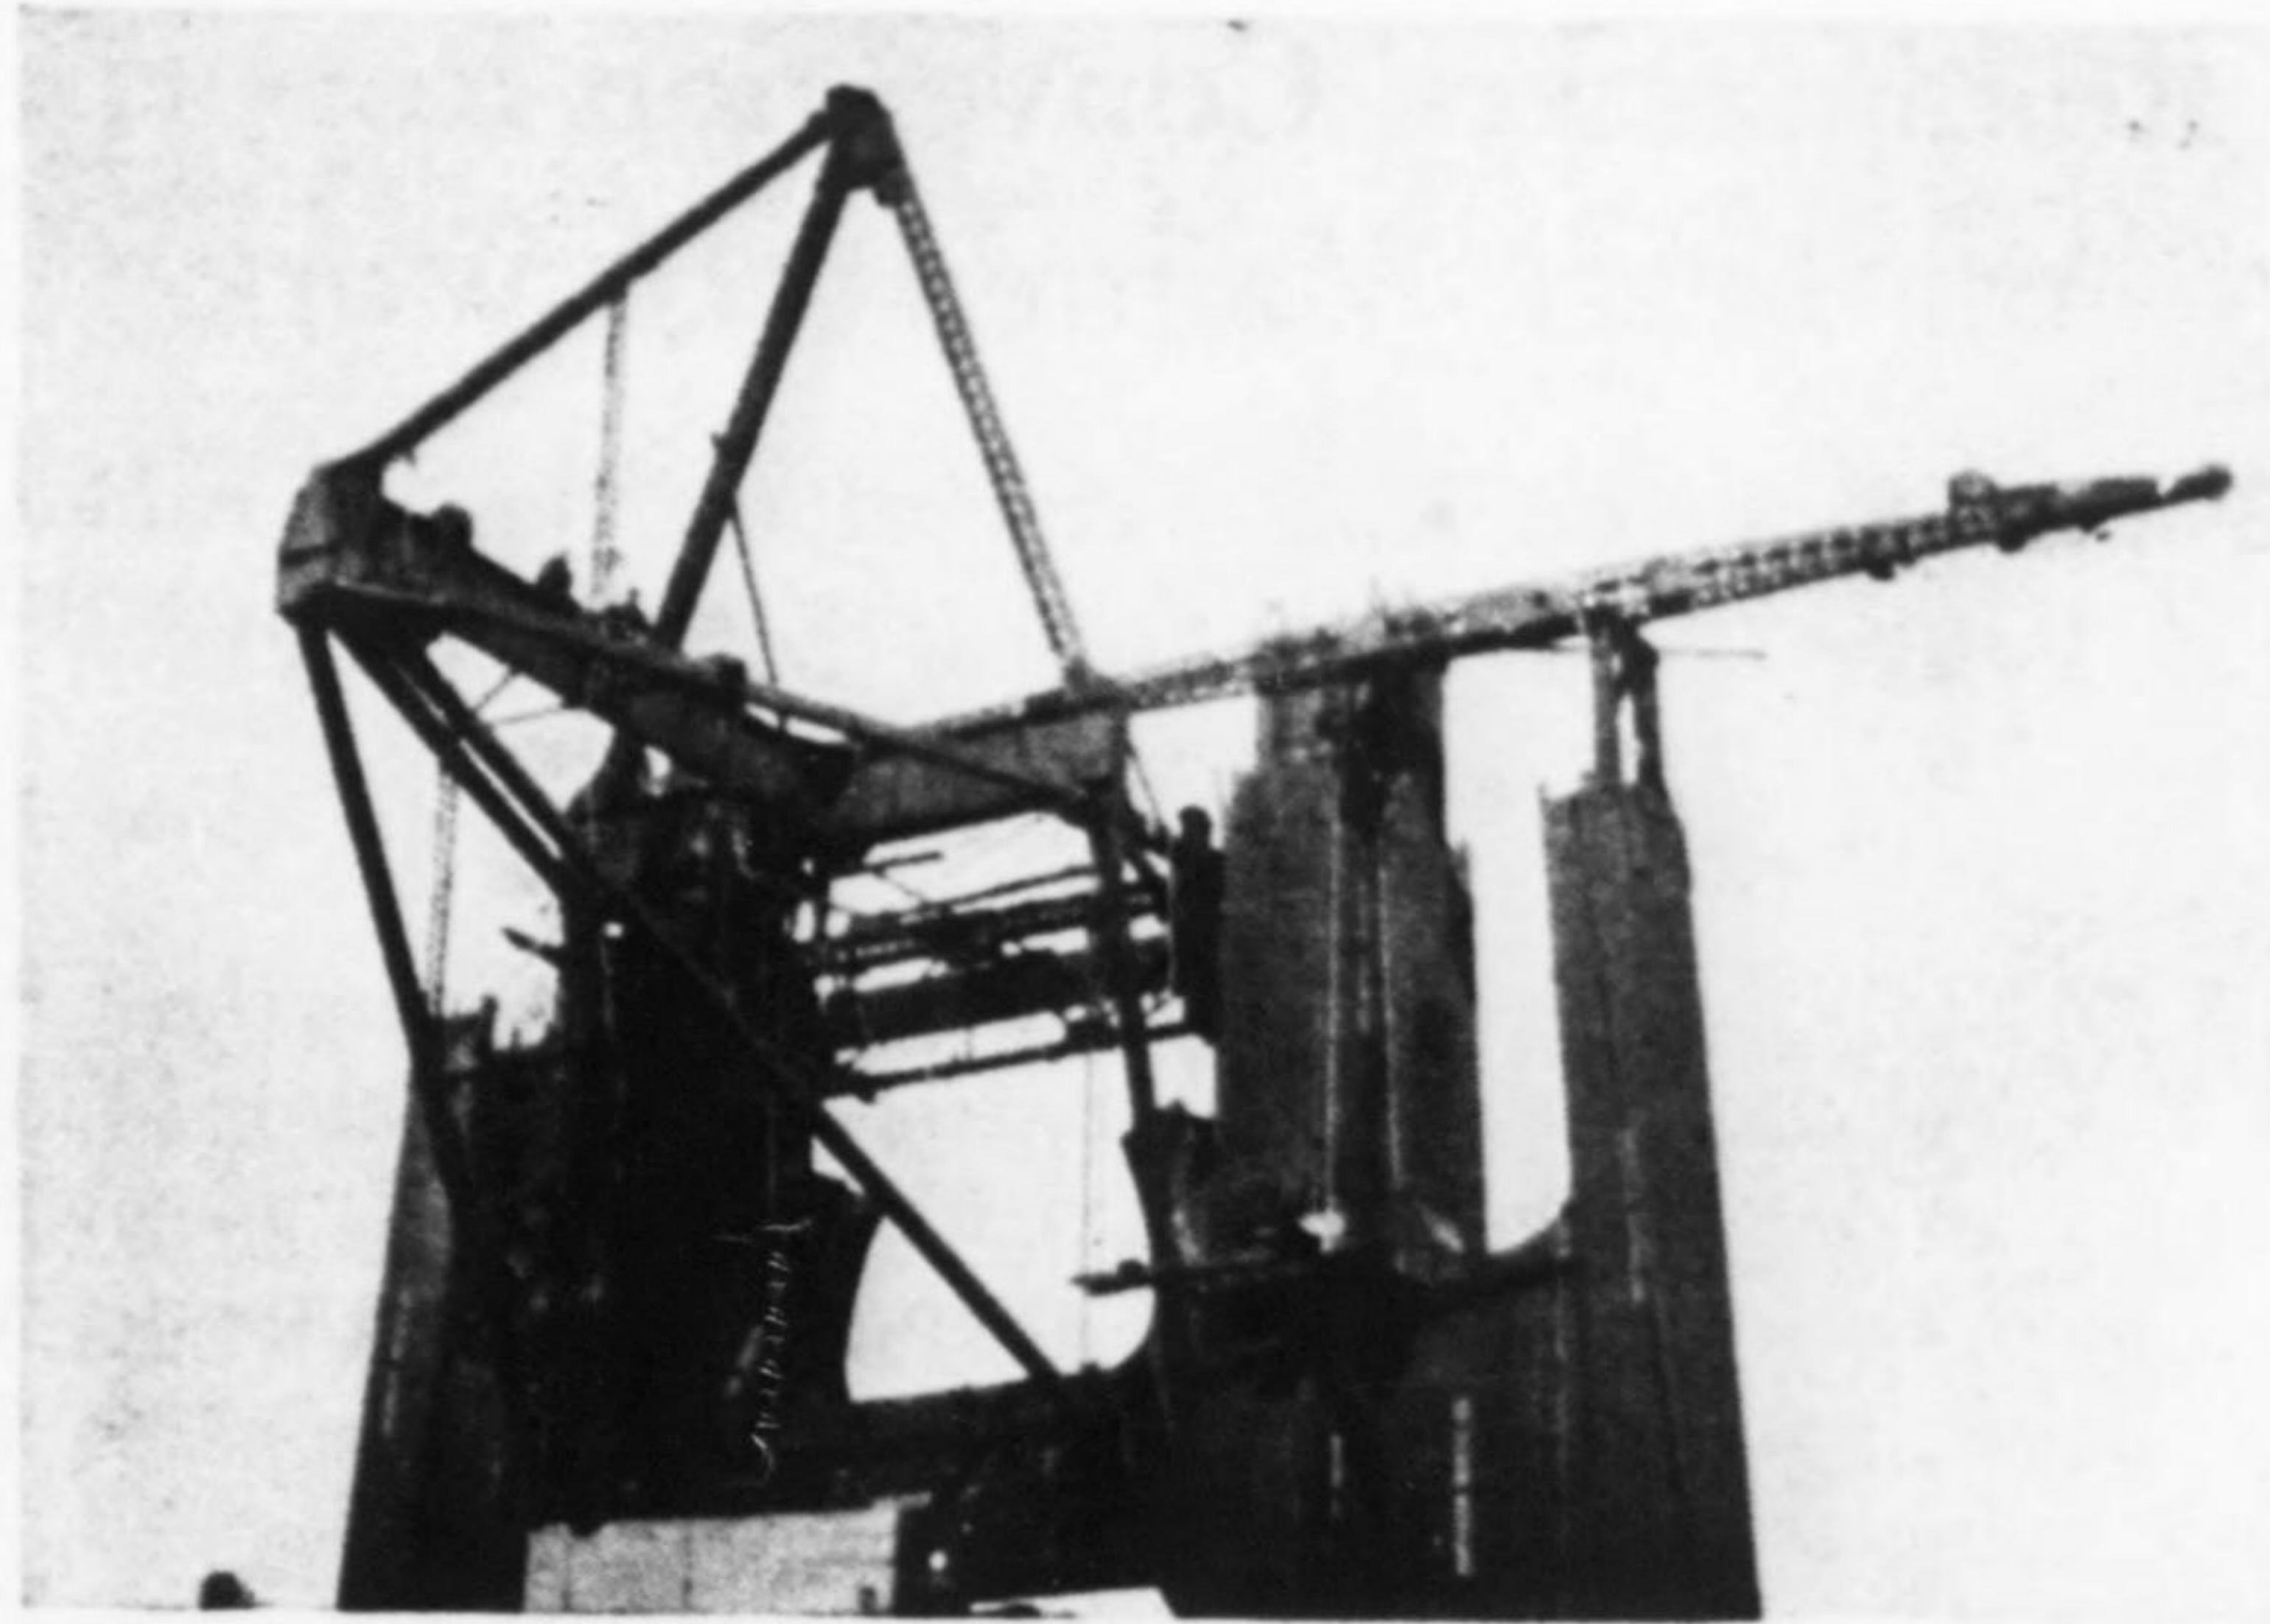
TRAVELER ERECTED COMPLETE EXCEPT FOR REEVING UP
